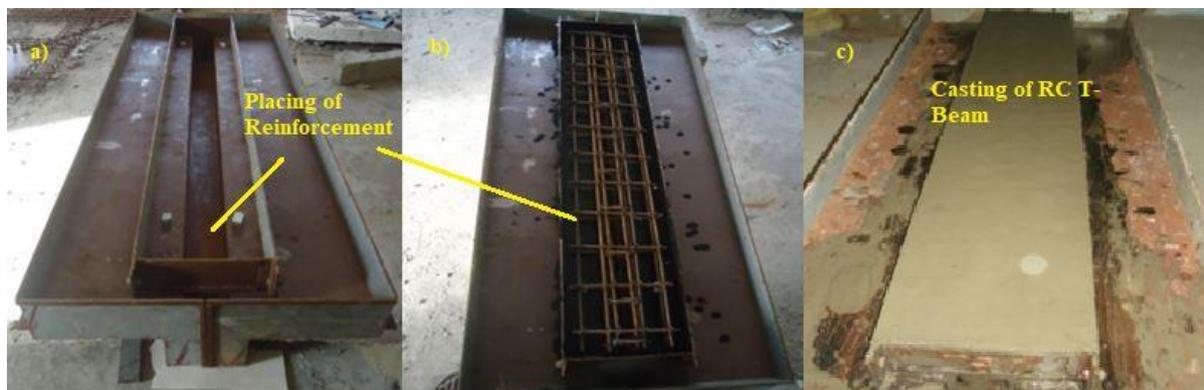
Placing of Reinforcement in T-Beam Steel Mould and Casting of Reinforced Concrete T-Beam
